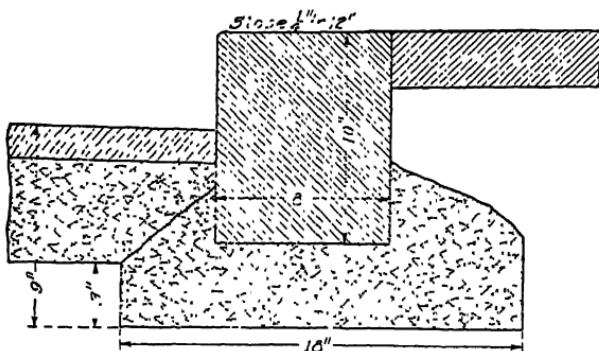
Typical Section Showing Stone Curb Eight Inches Thick
